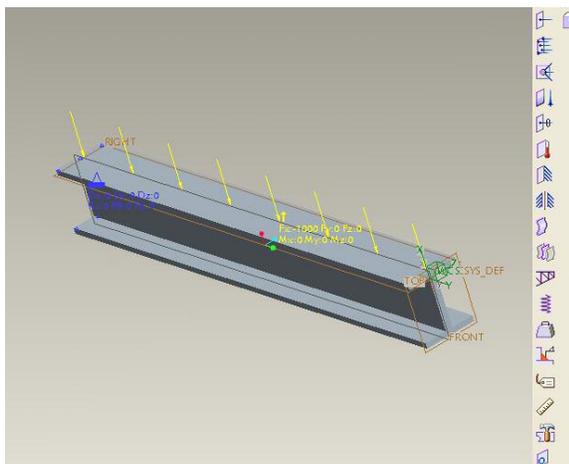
Detailed I-beam model with cantilever support and uniform loading of 1,000-lbs.
